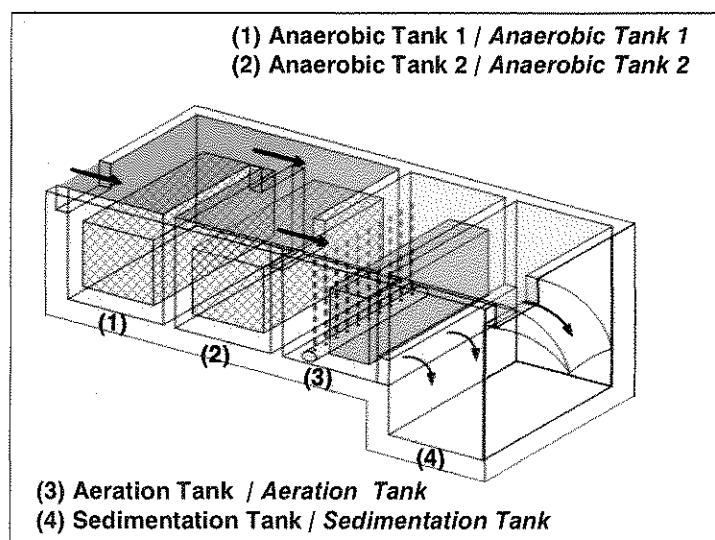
Outline of Proposed Wastewater Treatment Facility
